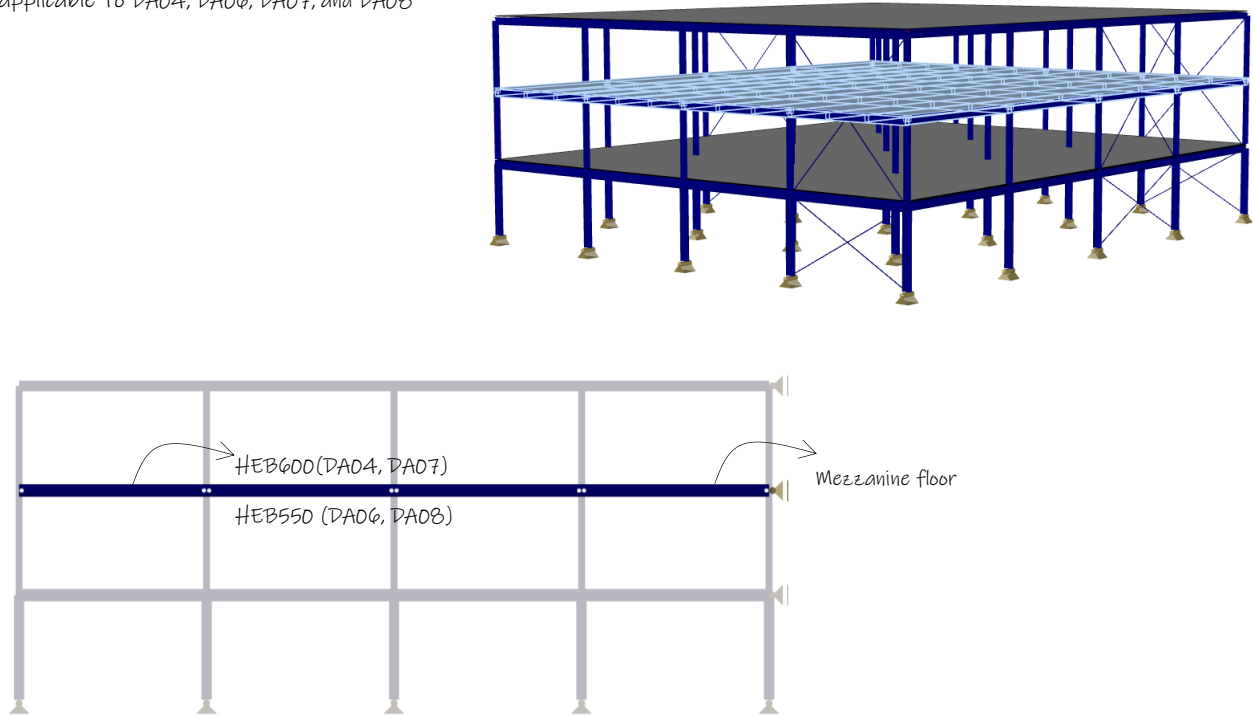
Mezzanine floor conceptual design, load changes and cross sections, applicable to DA04, DA06, DA07, and DA08.
